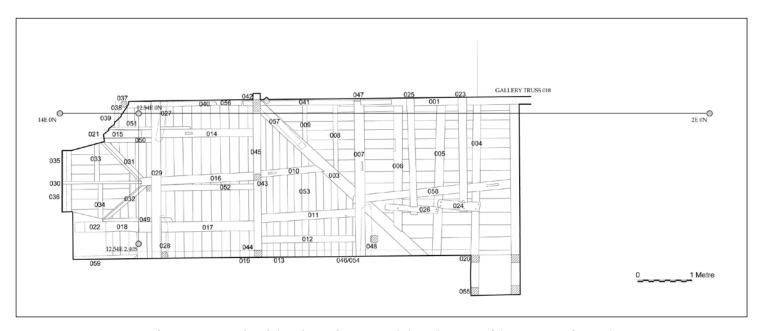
Underside Plan of East Bedchamber Roof (N to top of page)
